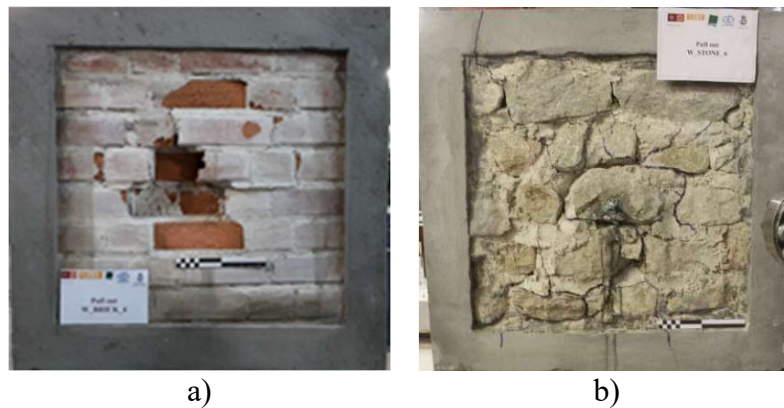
Pull-out experimental failure mode: a) brick masonry (Muñoz and Lourenço, 2019); b) stone masonry (Muñoz et al, 2019)
